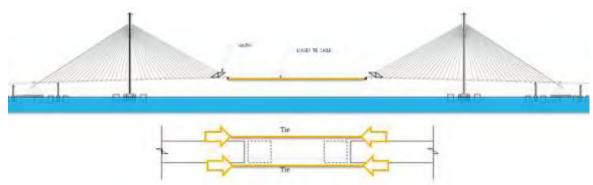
Tie-cable method for construction of partially earth anchored cable stayed bridge The construction concept can be defined as follows:
